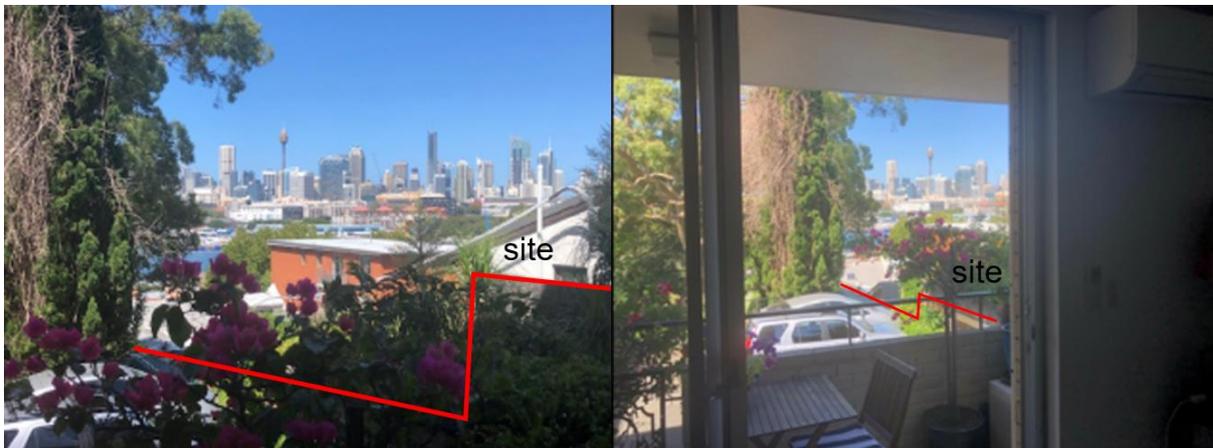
View from balcony and living room (standing) of first floor corner apartment (resident supplied)
